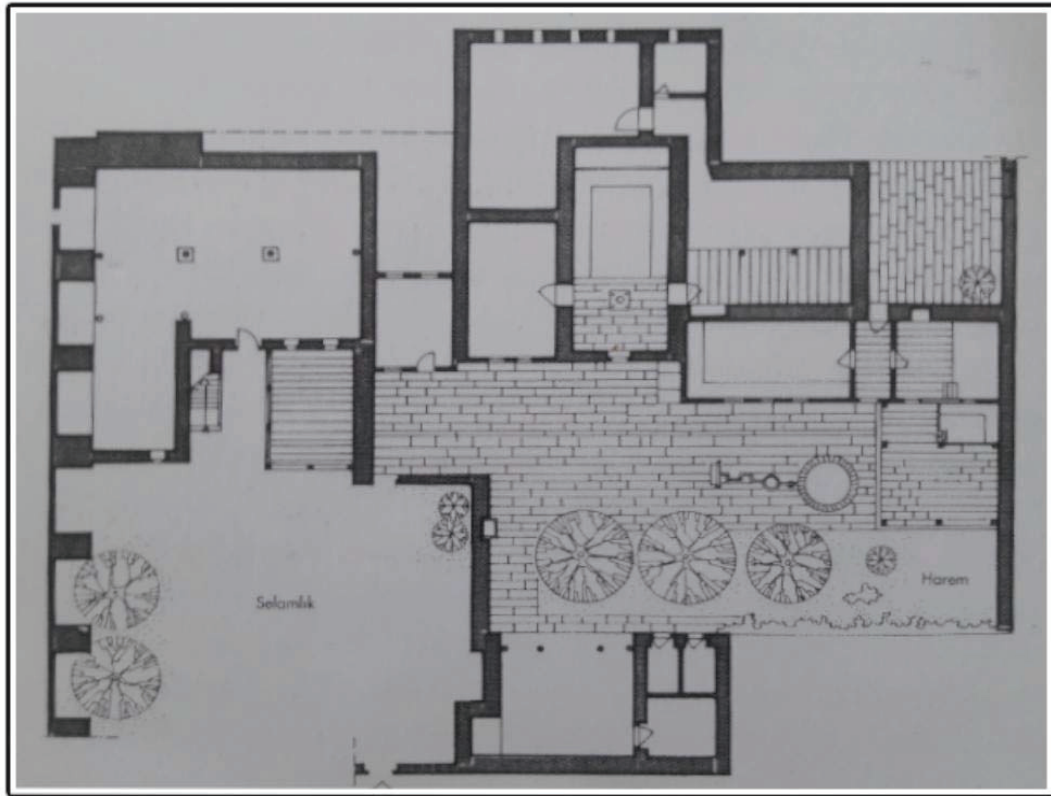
Ground floor plan of Güpgüpoğlu house. (Source: Kuban 1995, p.52)
